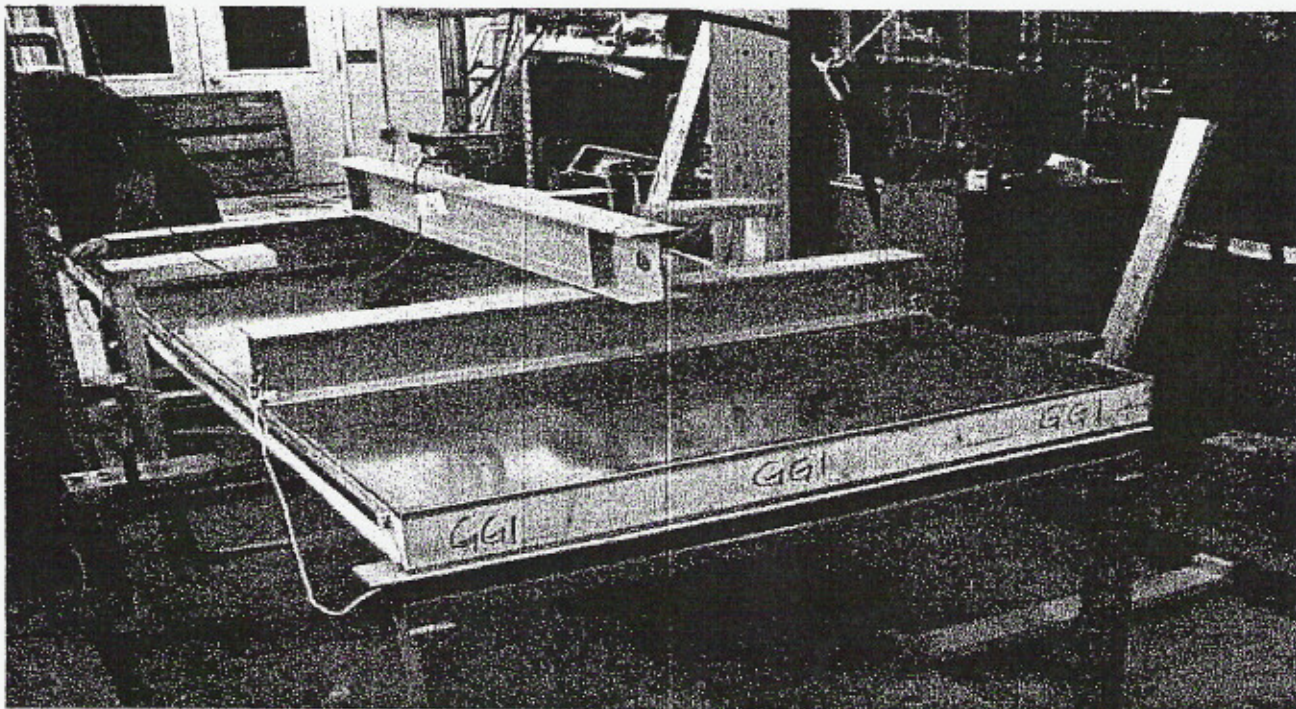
Test Setup for Transverse Loading 8' Galv.-Galv. Panel
